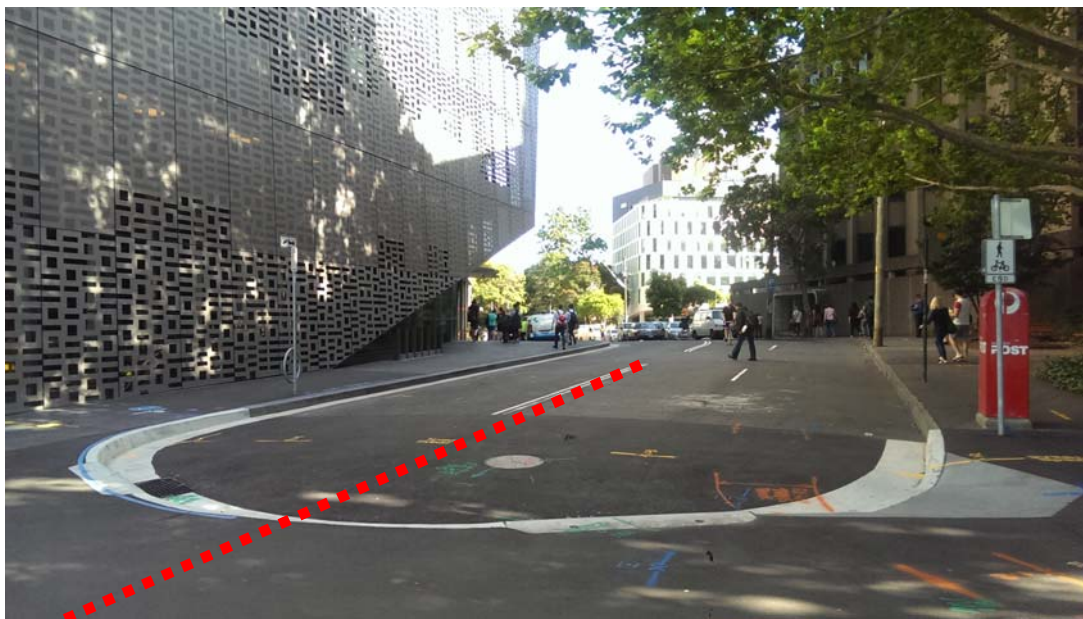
The general location of the proposed works (to be constructed underground) on Jones Street. The pipeline terminates underground.
